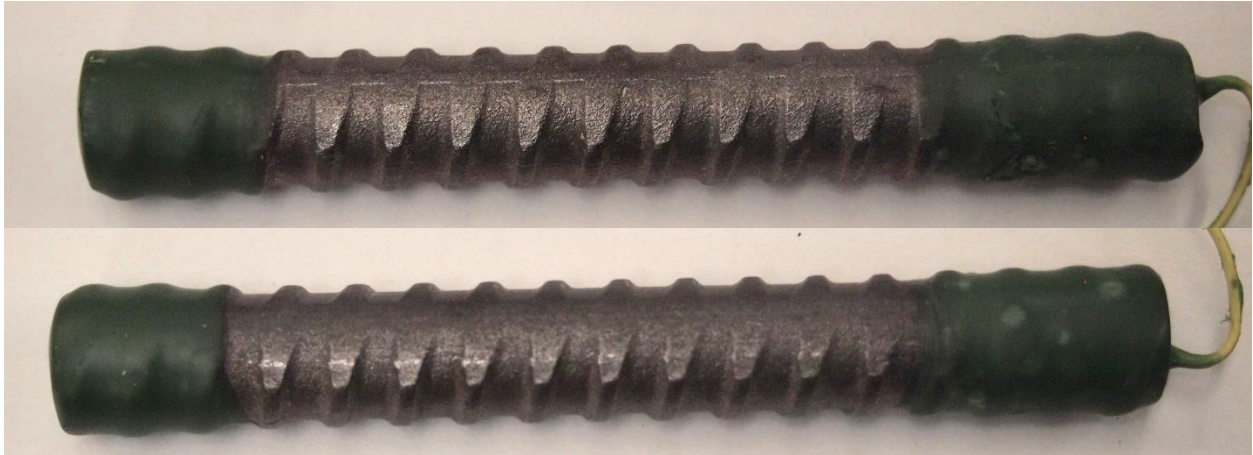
Specimen SBO-06 before testing (top) and after testing (bottom). Corrosion product observed on rebar and on concrete surface in contact with rebar
